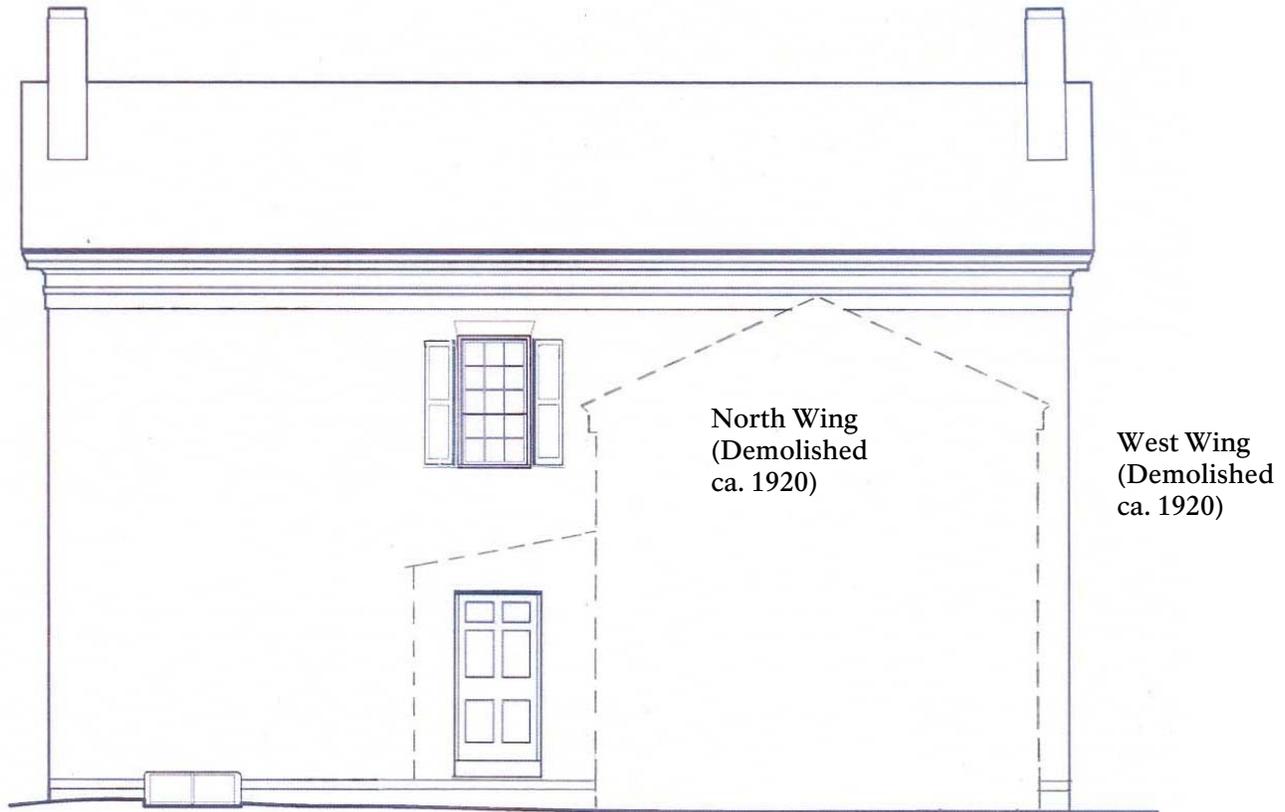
Conjectural north elevation of the Hunt House, circa 1848.
